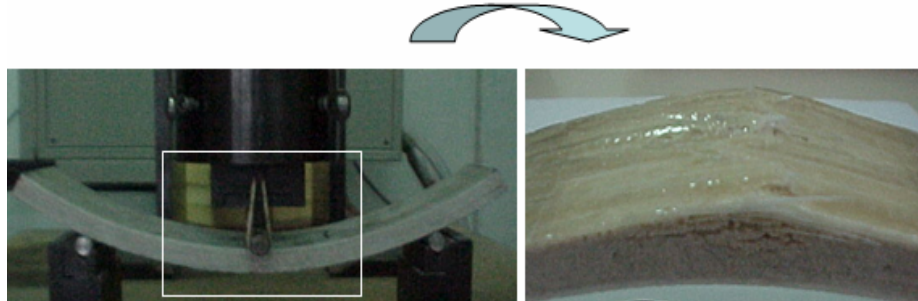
Delamination on the loading section of a specimen tested in three-point bending with the concave side up.
